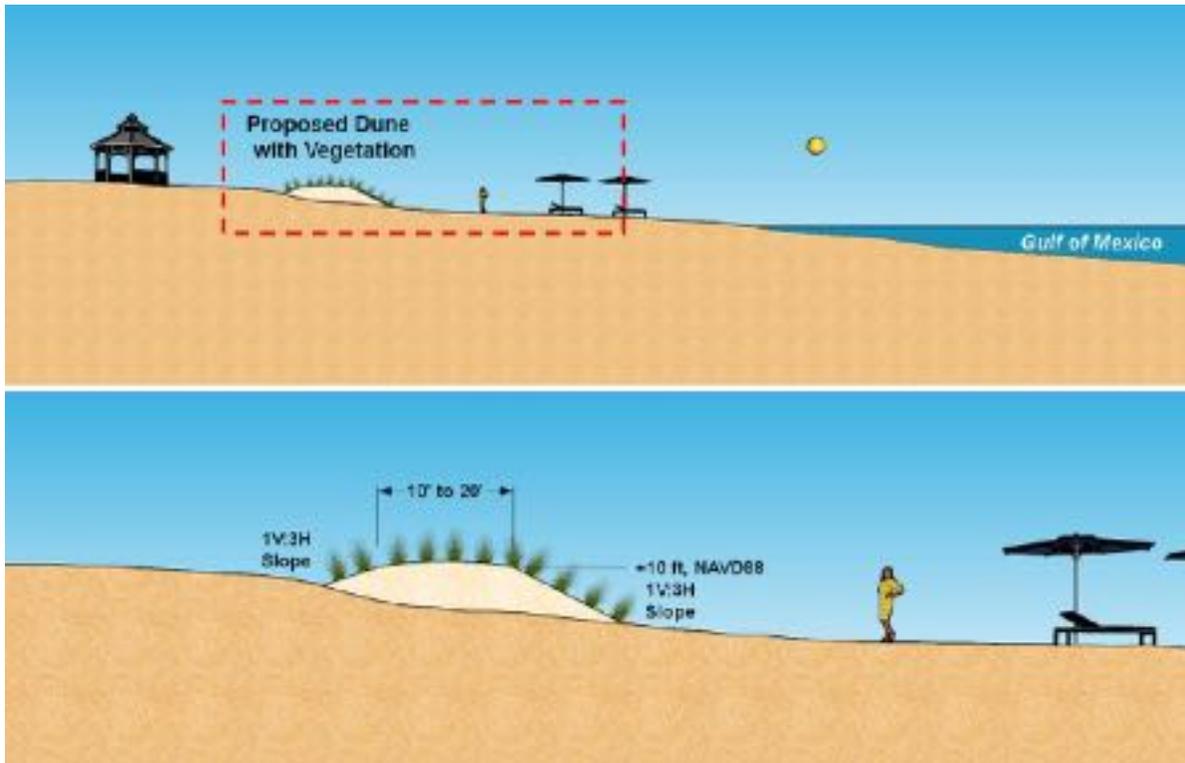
Typical Type C Dune overview (above) and detail view (below).
